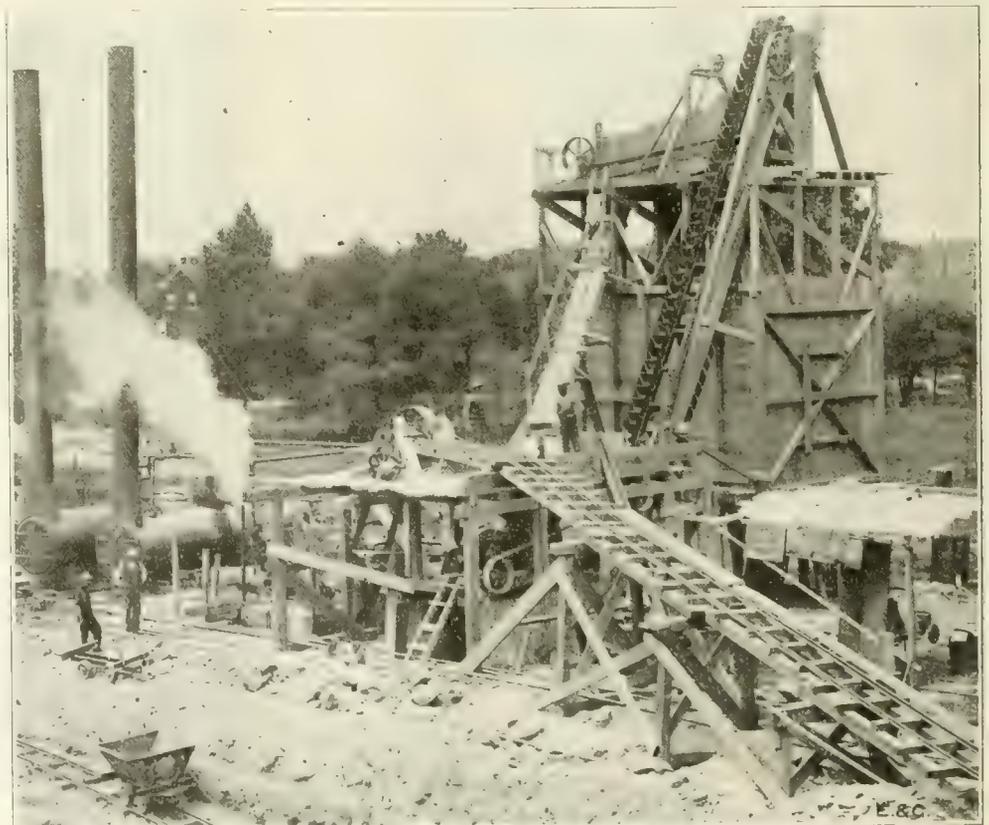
View of Crusher Plant at Westerly End of Waban Hill Water Tunnel.
